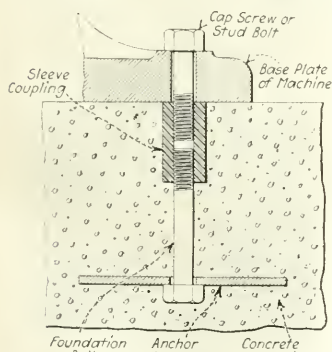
SLEEVE COUPLING PROVIDES PLACE FOR BOLT
